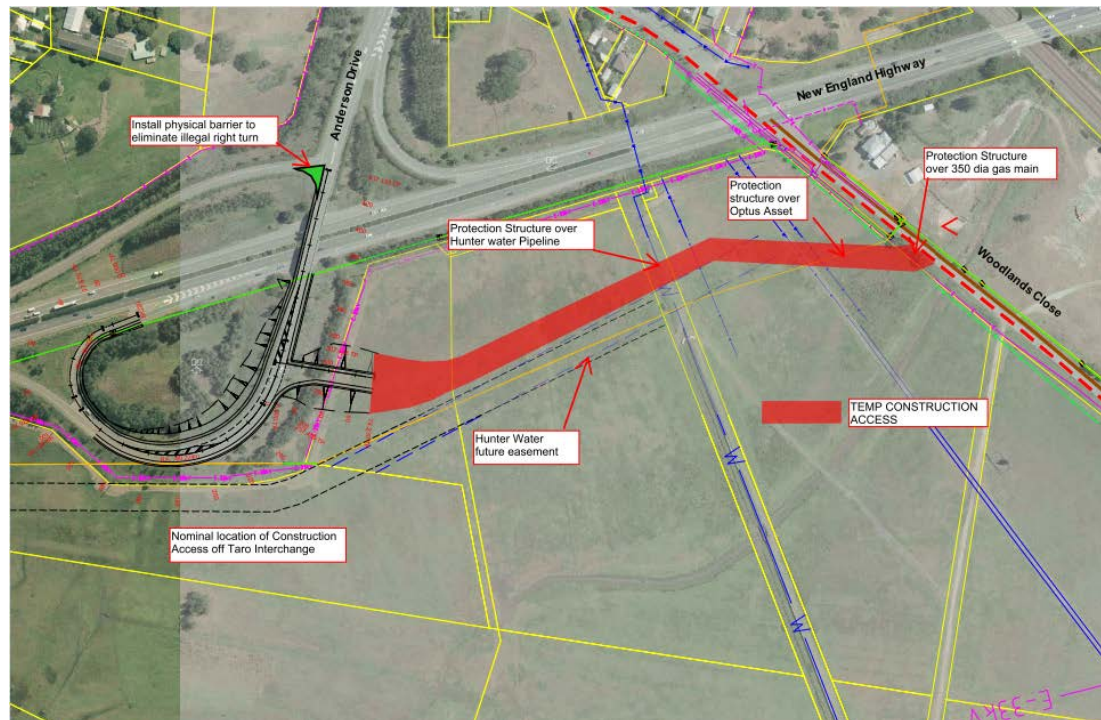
Proposed temporary construction access road connecting with the Tarro Interchange and a median barrier on Anderson Drive
